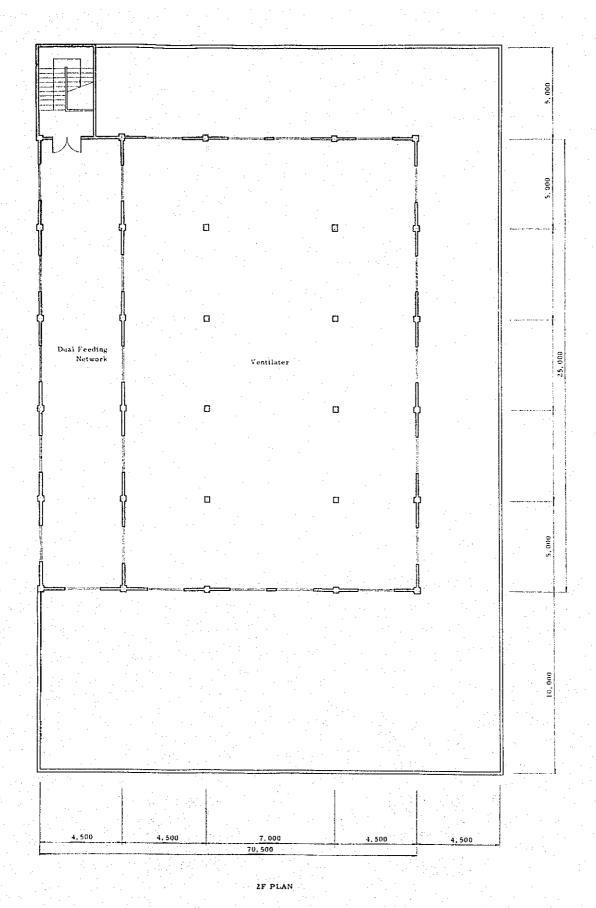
Floor PLAN of New Radio Transmitter Building No. 2
